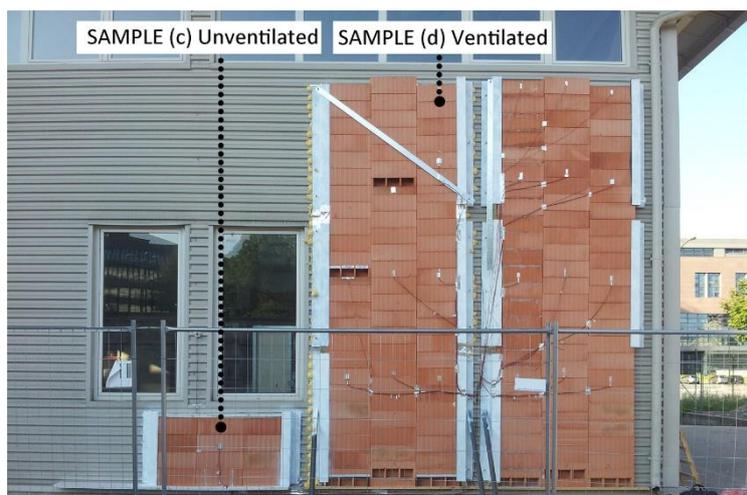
(OAC) samples installed on the south-west façade of the laboratory.
